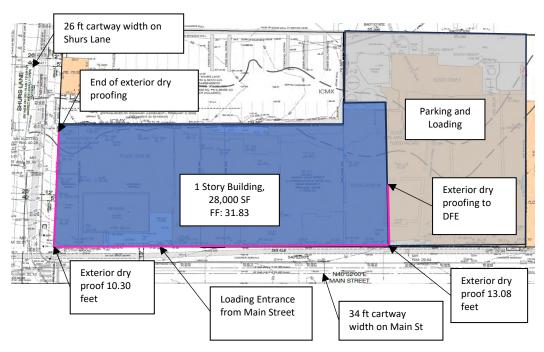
Scenario 1B: Reduce building footprint to approximately 28,000 square feet and building height to 1 story. Accommodate required parking and loading.
